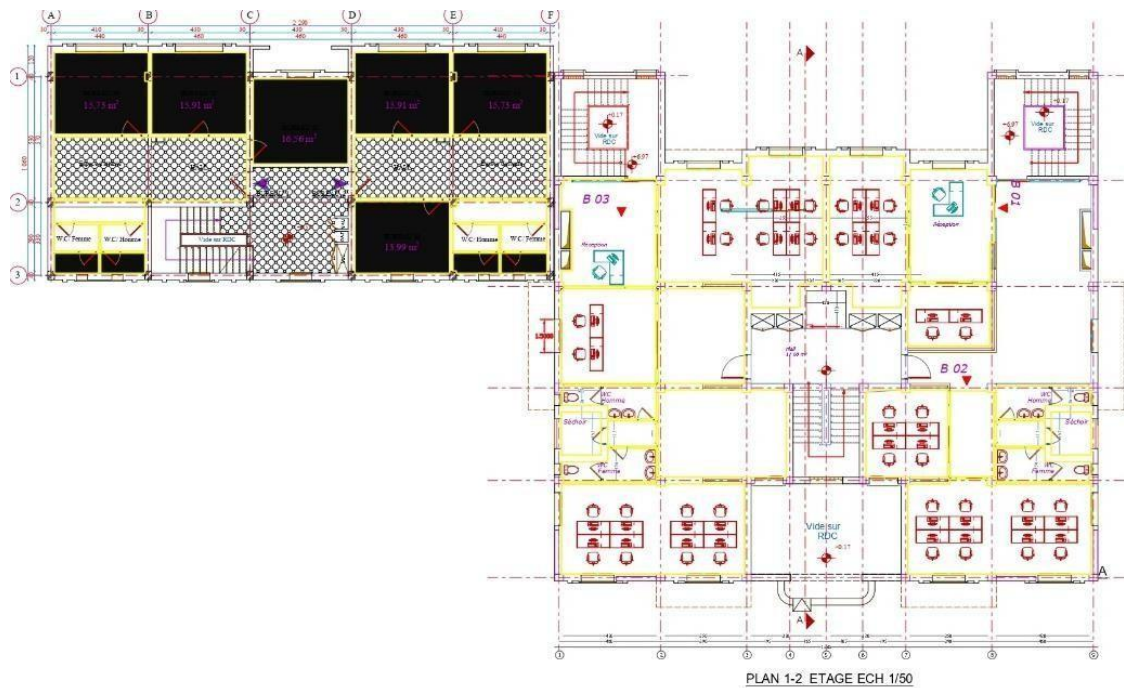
First and Second Floor Plan (Source: design office Nebar Omar +Author treatment , 2025).
